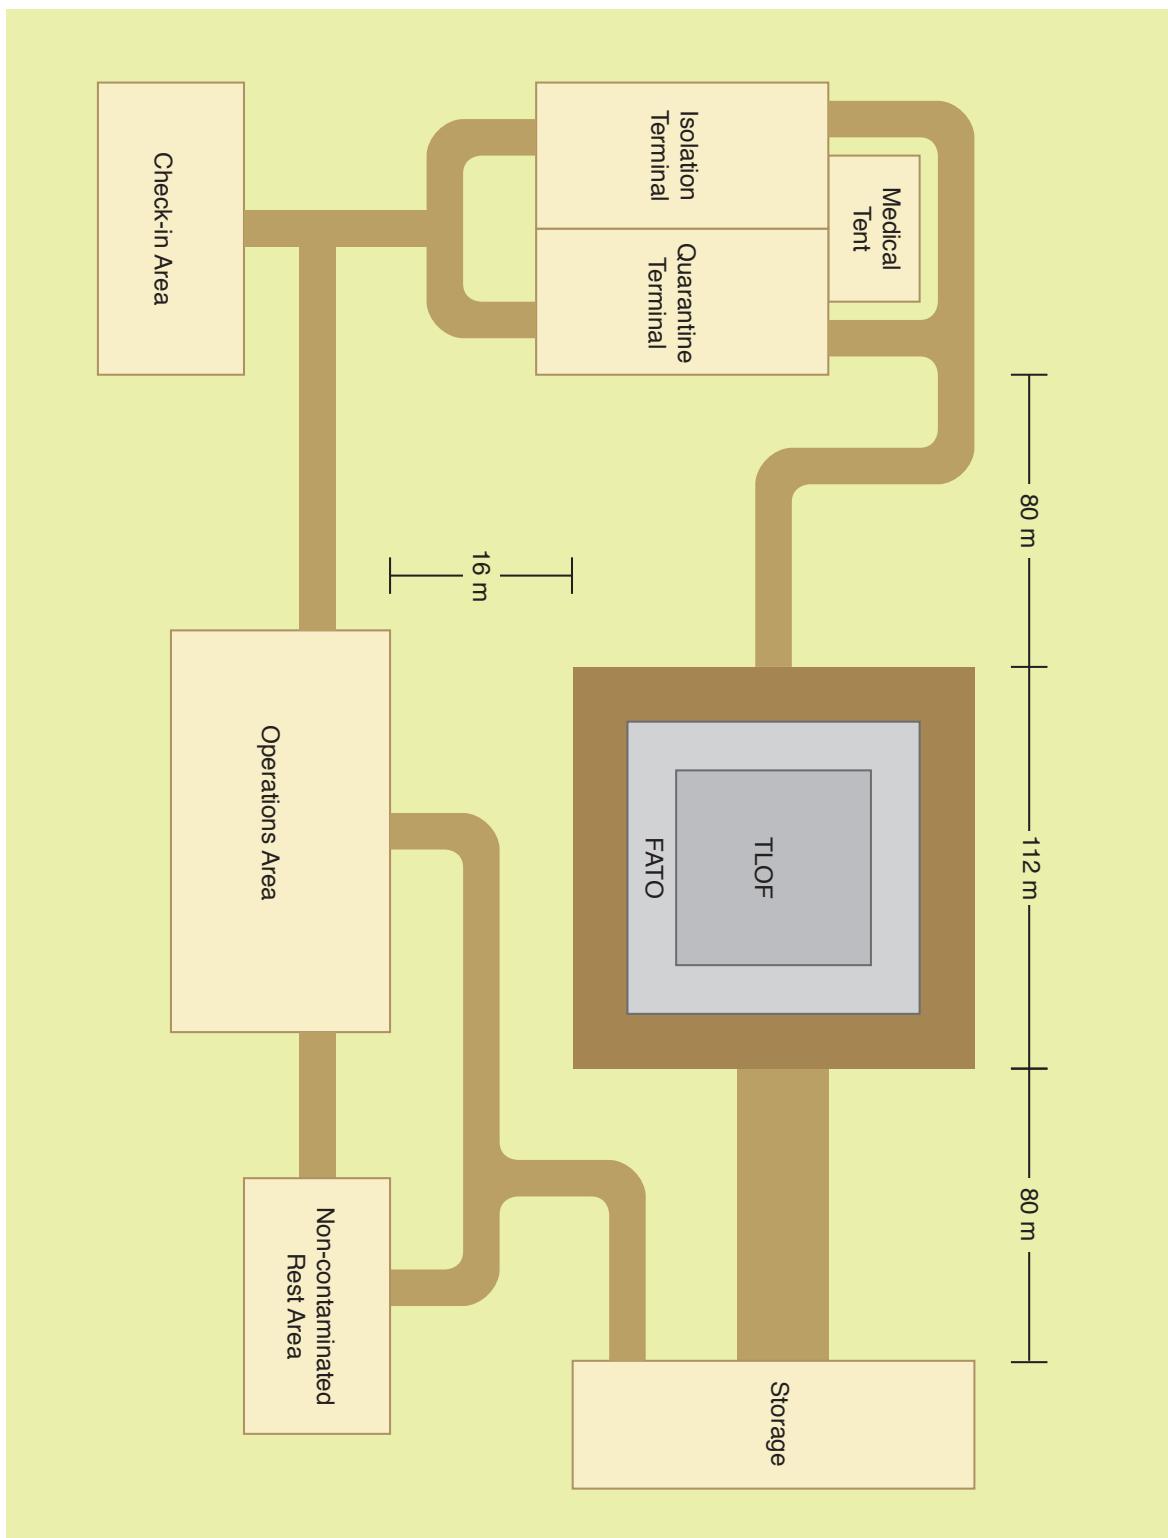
ERRA Proposed Layout with Minimum Separation Requirements
